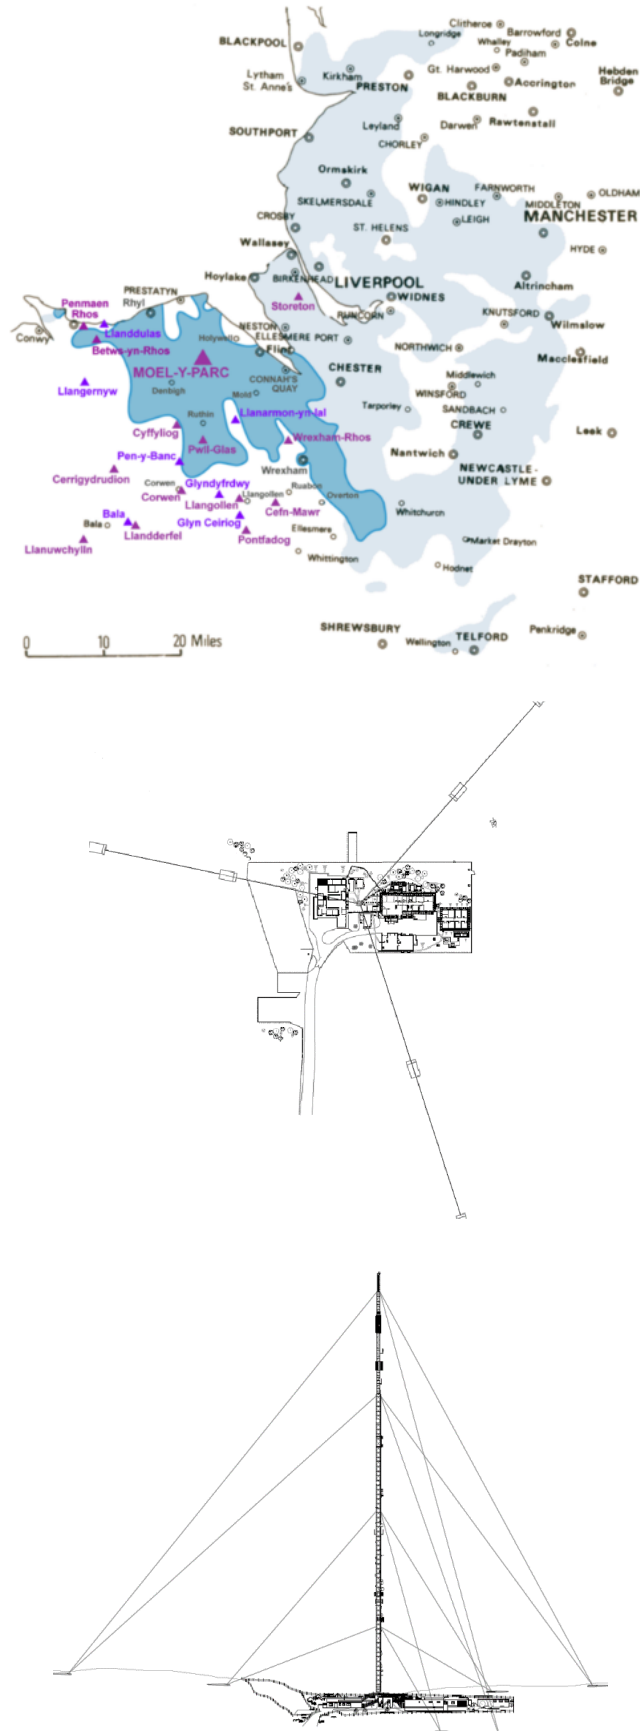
Moel-y-Parc HGM. A) Coverage. B) Site Plan. C) Elevation.
